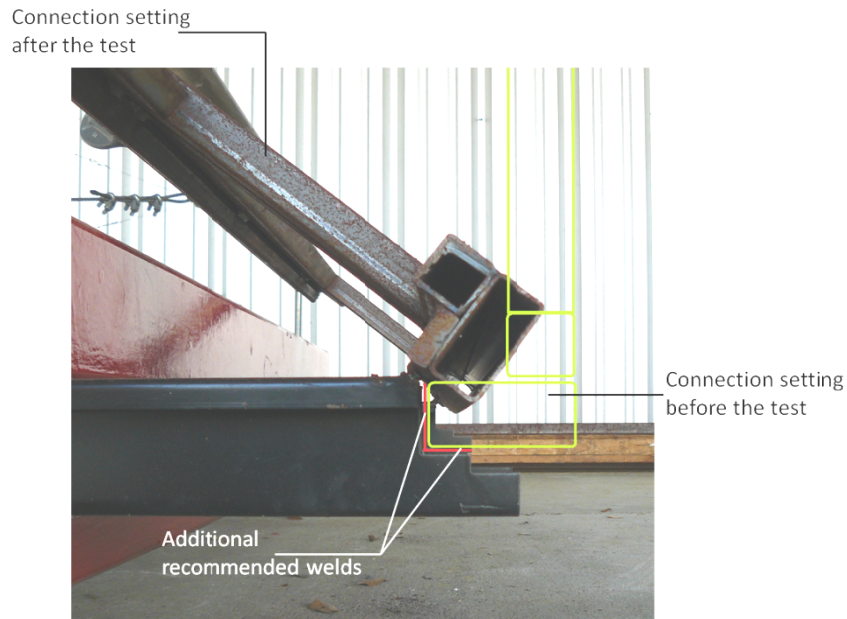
Wall-to-floor connection setting before and after the test, additional recommended welds have been shown.
